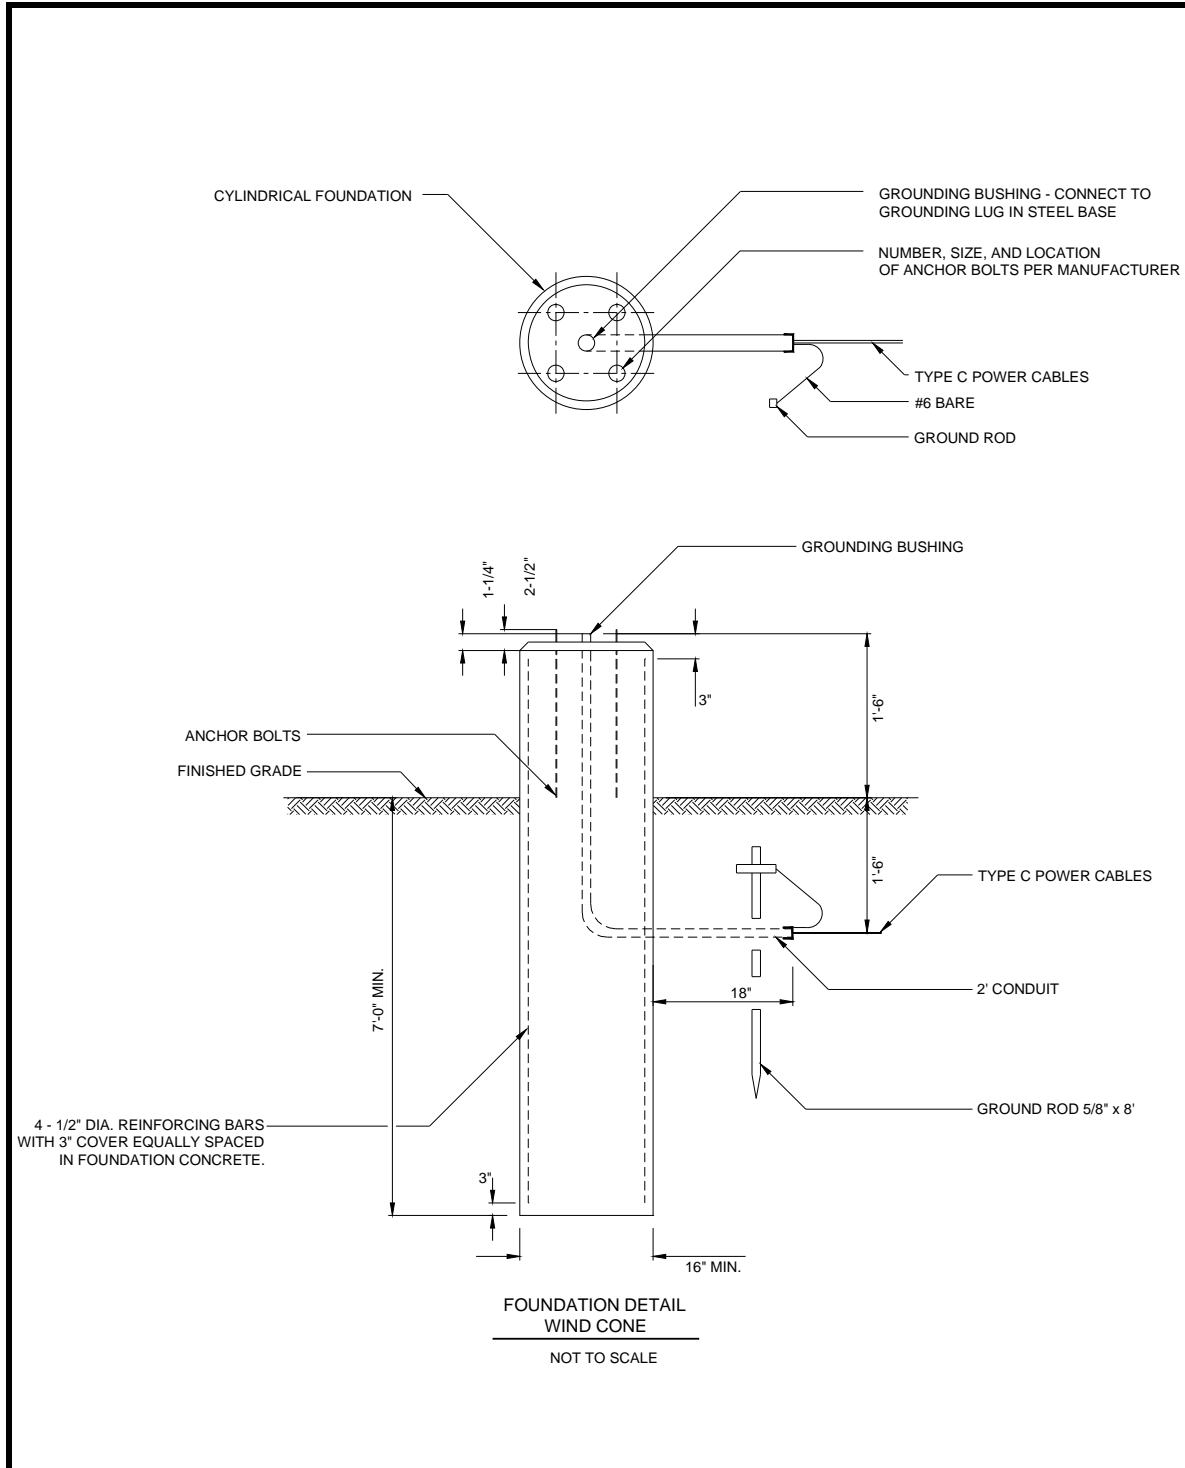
Standard Details for Wind Cone Foundation (L-807).
